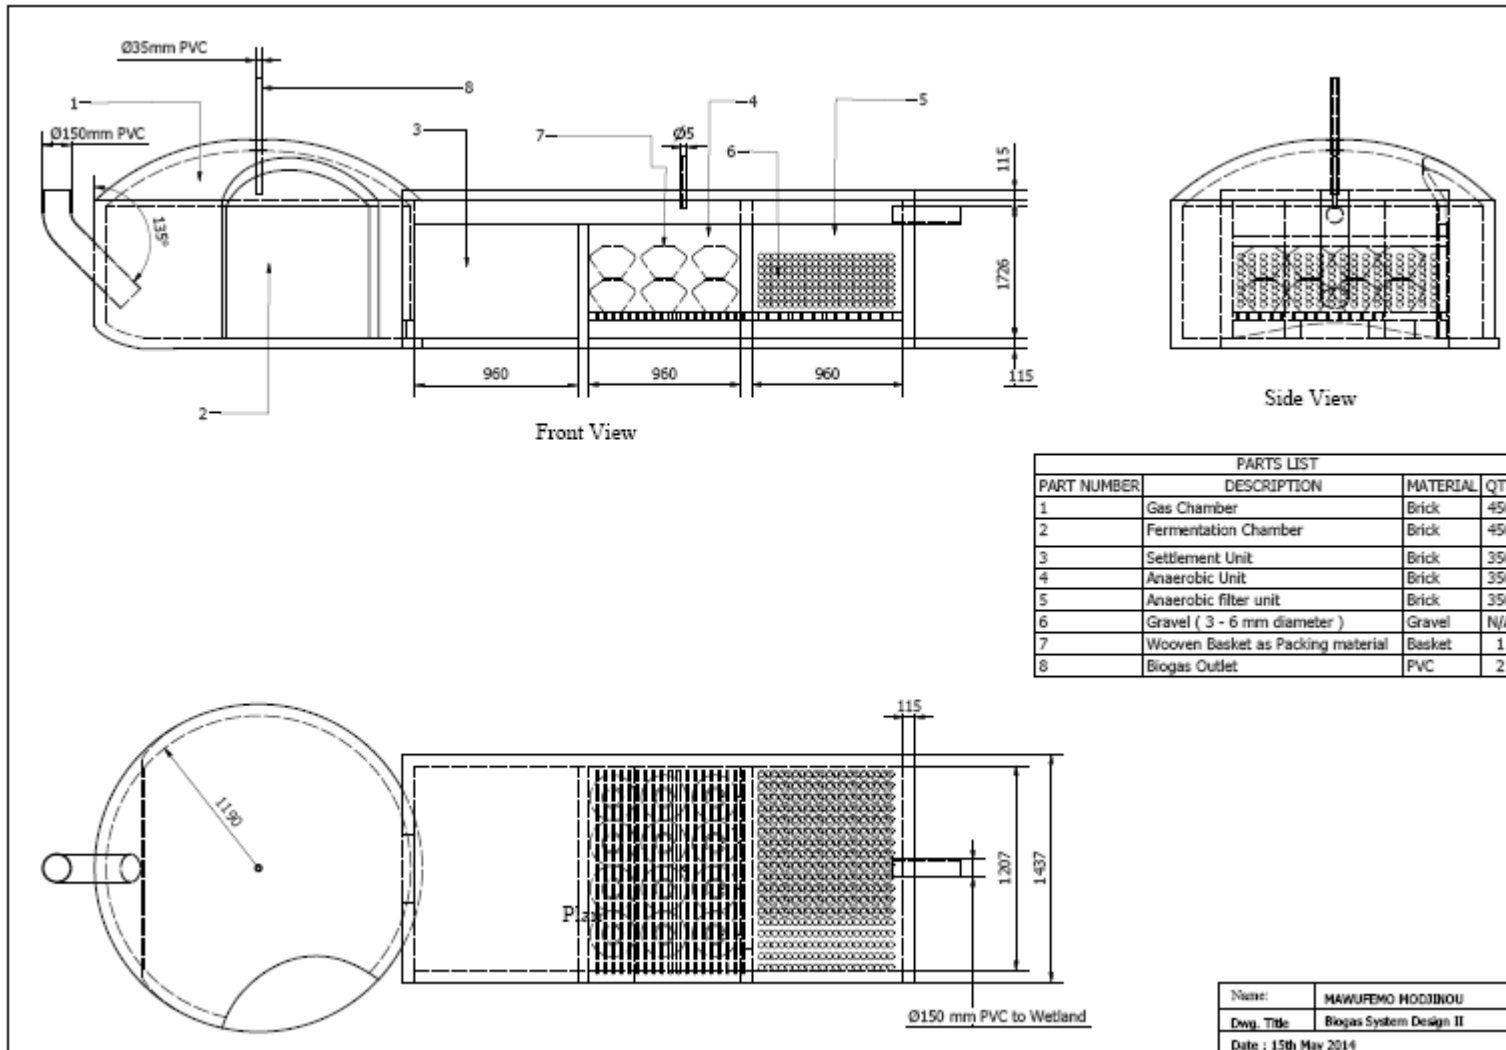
Detail drawing of the proposed Biogas Septic Tank (Design II)
